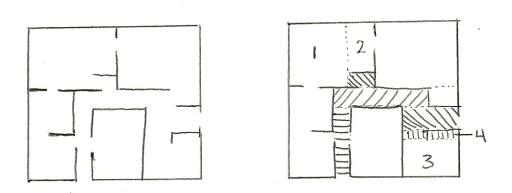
(left) Schematic illustrating the architectural arrangement of a building. (right) Schematic illustrating the same building with the rooms divided into convex spaces. Shaded spaces are part of a hallway with 'low definition'. This space is defined by the external boundaries of the surrounding spaces (redrawn from Grahame 2000:fig 4.5)
